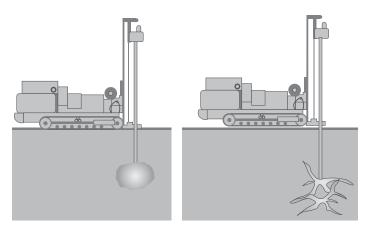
Cement Grouting (Slurry Grouting) Technique
